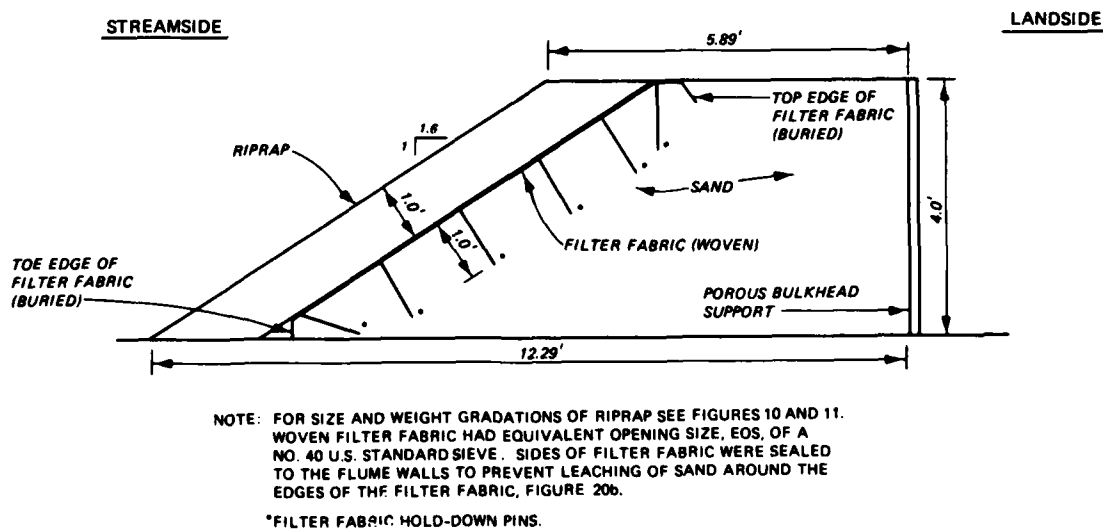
Plan 5B, sand streambanks with 1.0 ft of riprap and woven filter fabric protection
